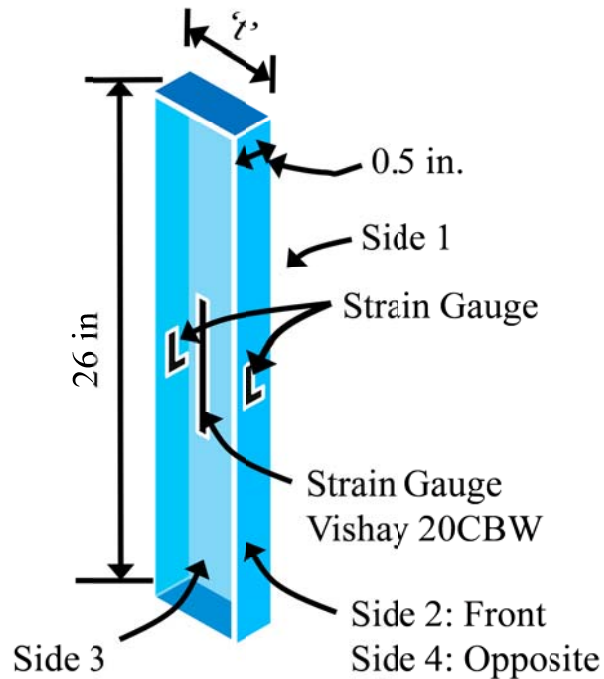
In-Plane Tension Test Specimen Dimensions and Strain Gauge Locations
